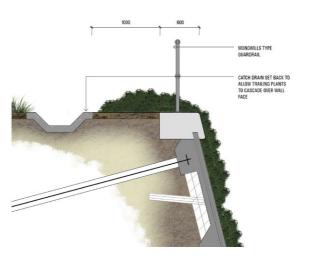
Typical Soil Nail Cutting Treatment with planting
